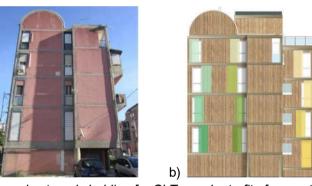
Proposed external cladding for CLT panel retrofit of case study building:
